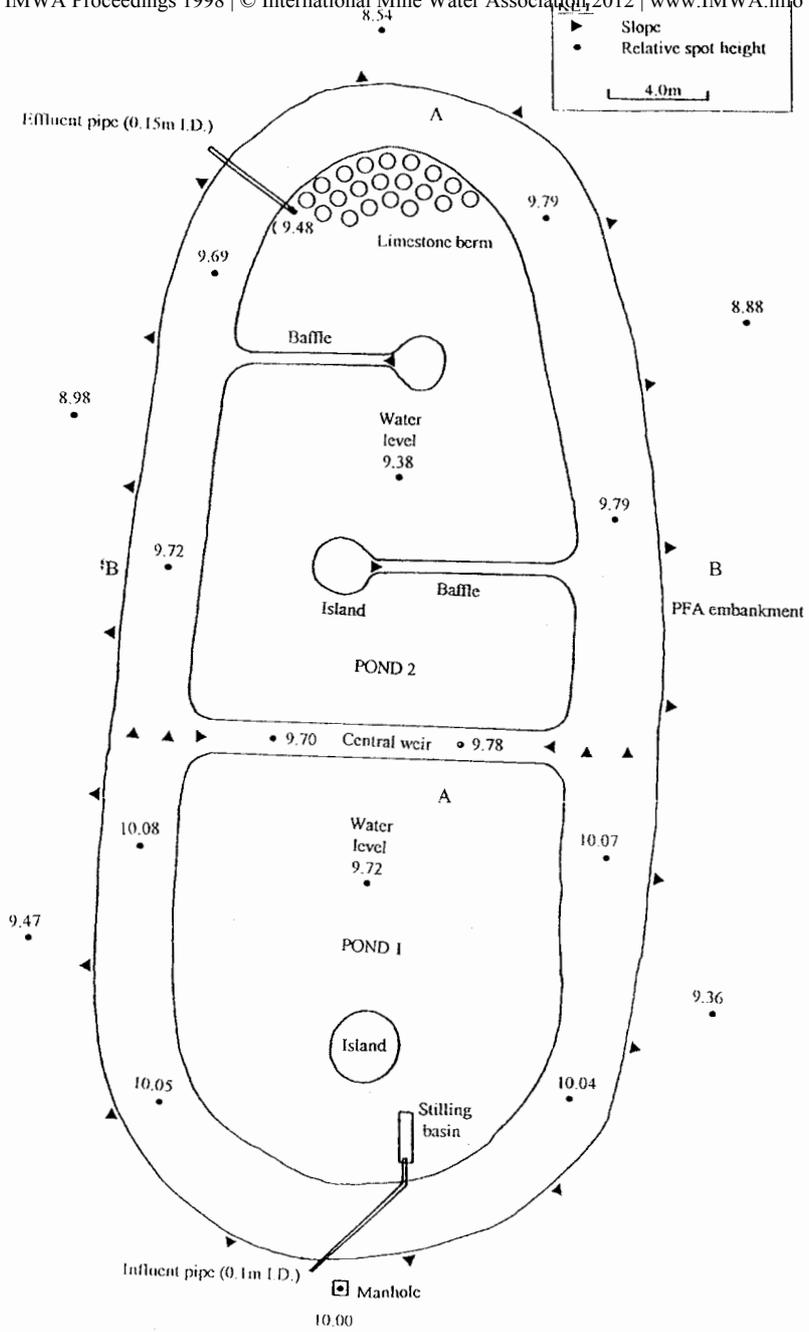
As-built plan of the full-scale wetland at Quaking Houses
